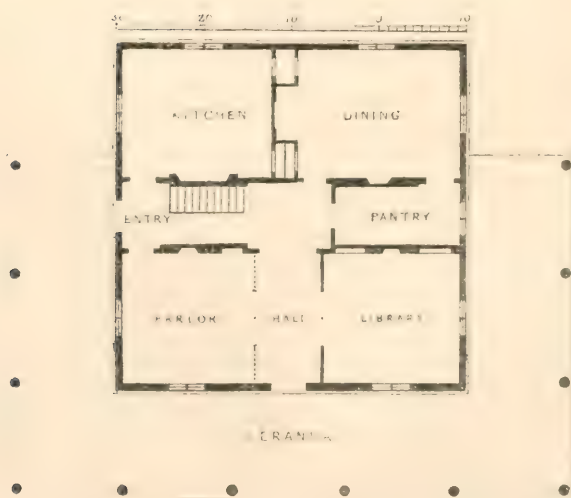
PLAN OF PRINCIPAL FLOOR.
